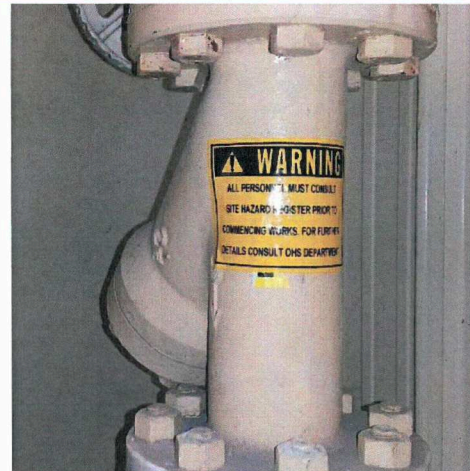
Level 9, North-East Plant Room, Hot Water Pipe - Gasket
